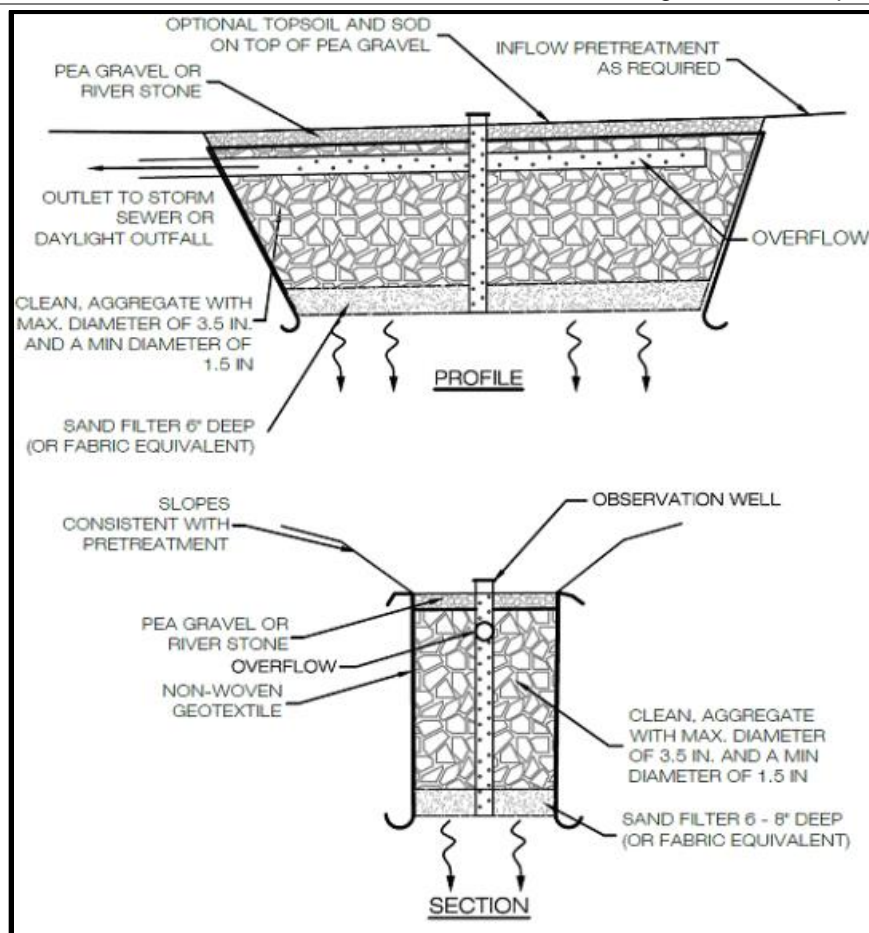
Typical Profile & Section View of an infiltration Trench
